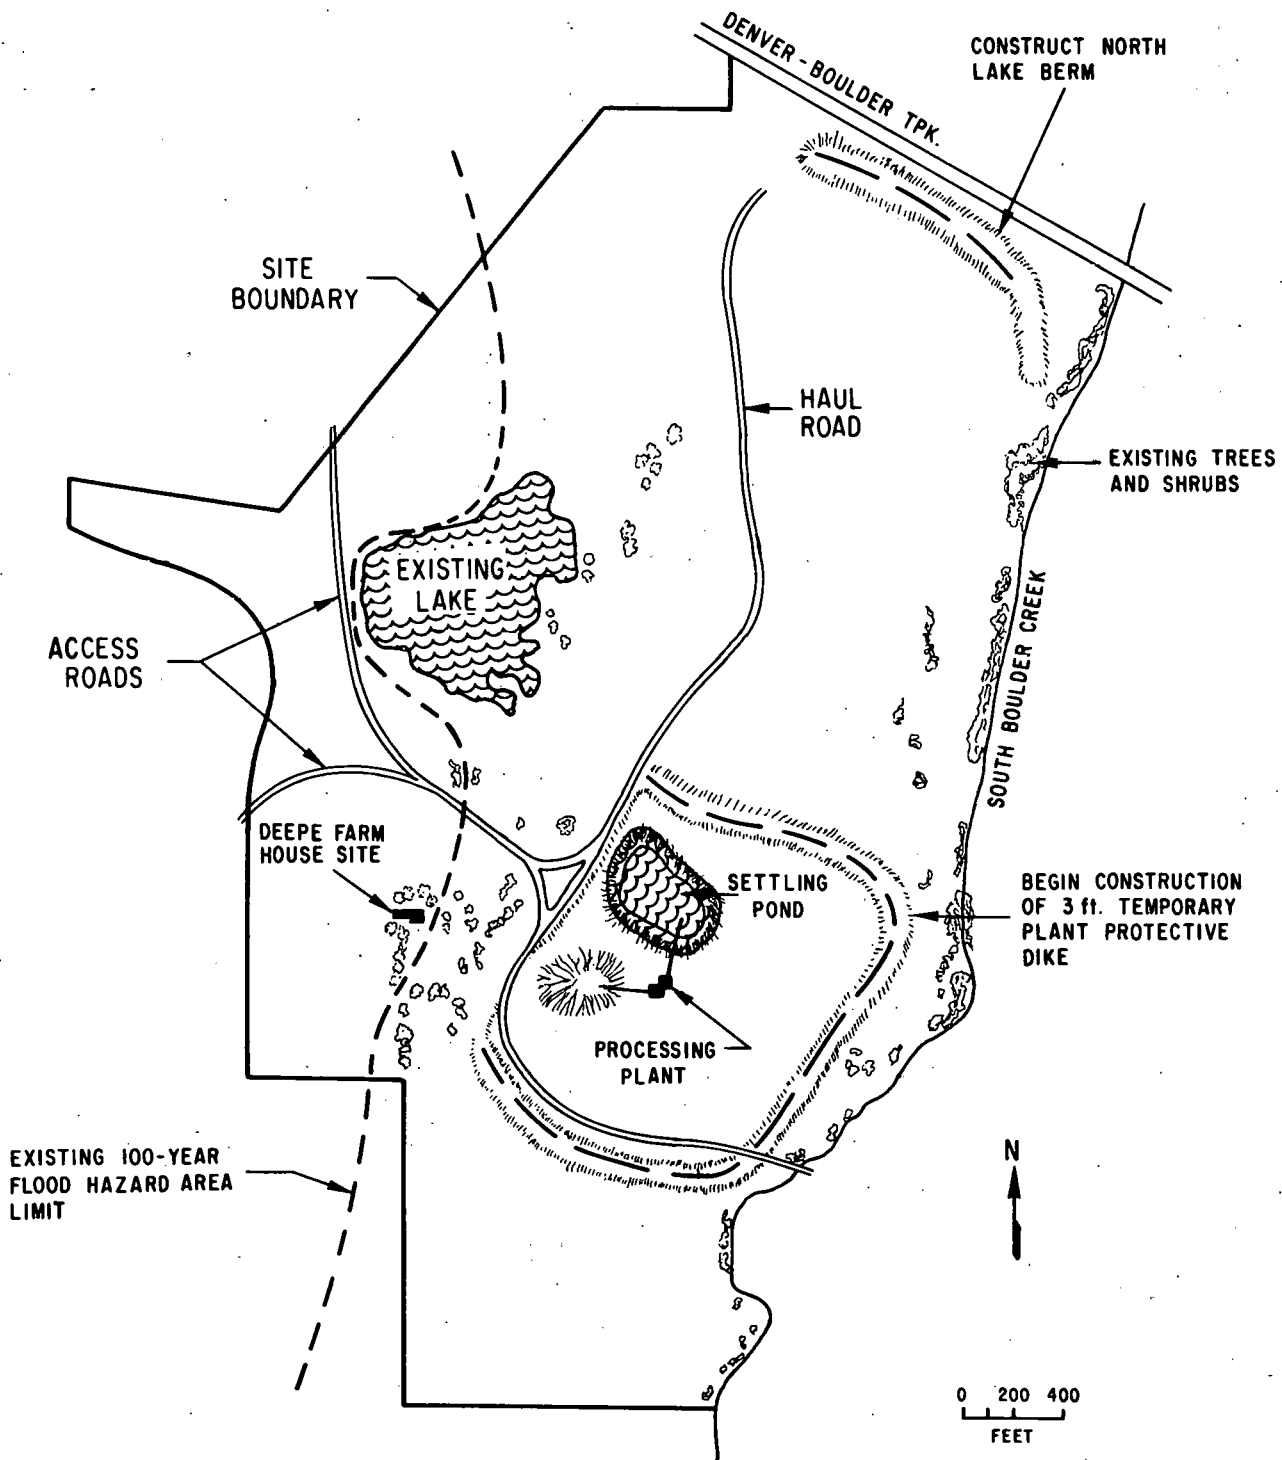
Processing Plant Location, Mining/Reclamation Stage 1, South Boulder Creek Park Project (after EIA, 1975)
